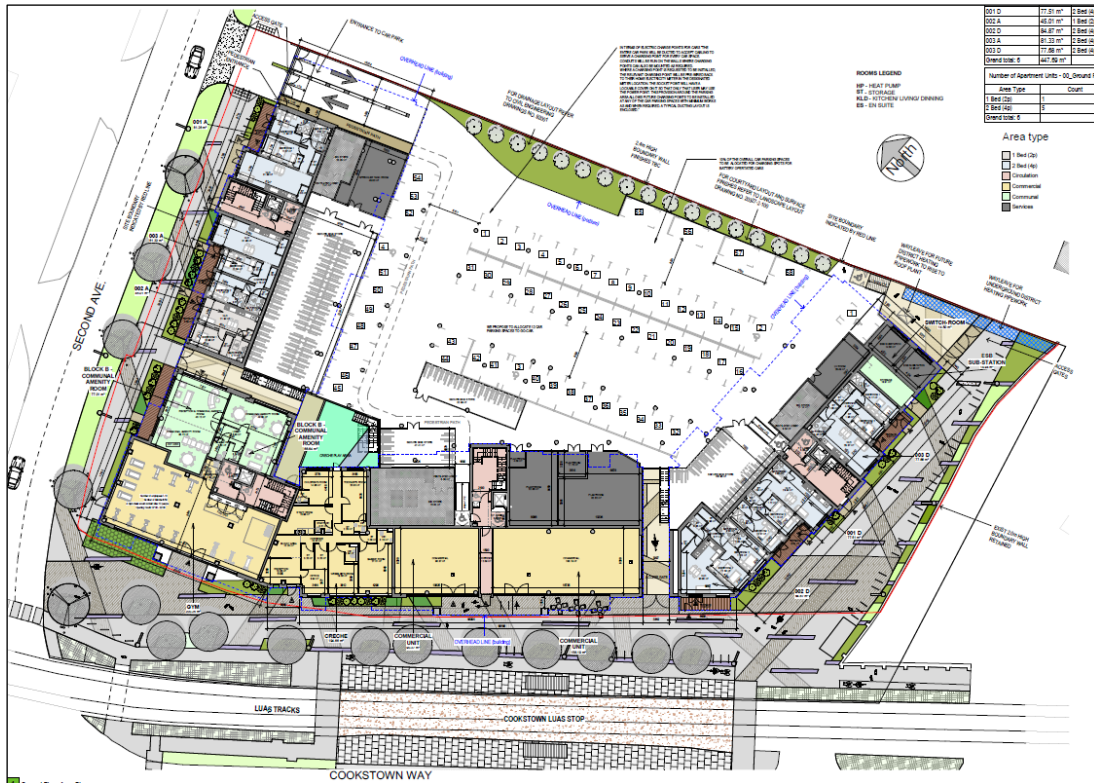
Ground floor plan of proposed amended development under ABP Ref. ABP-307177-20
